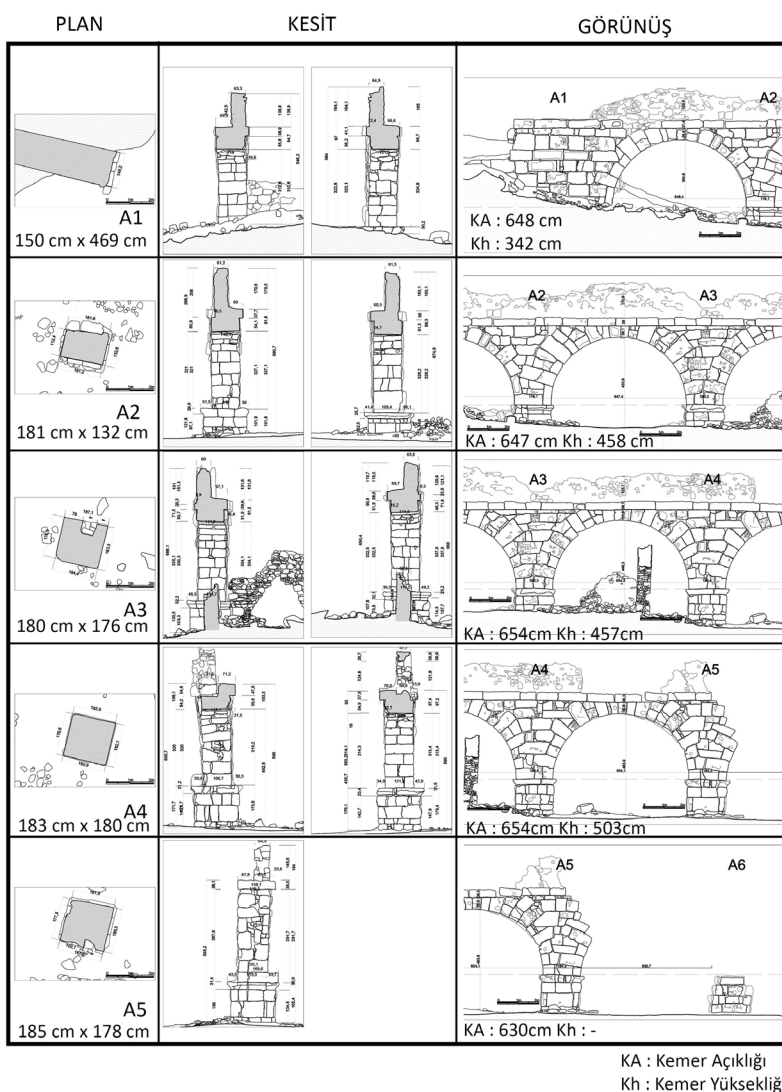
Plans, Sections, and Elevations of A1, A2, A3, A4, and A5 (Cesur 2024, 100)
